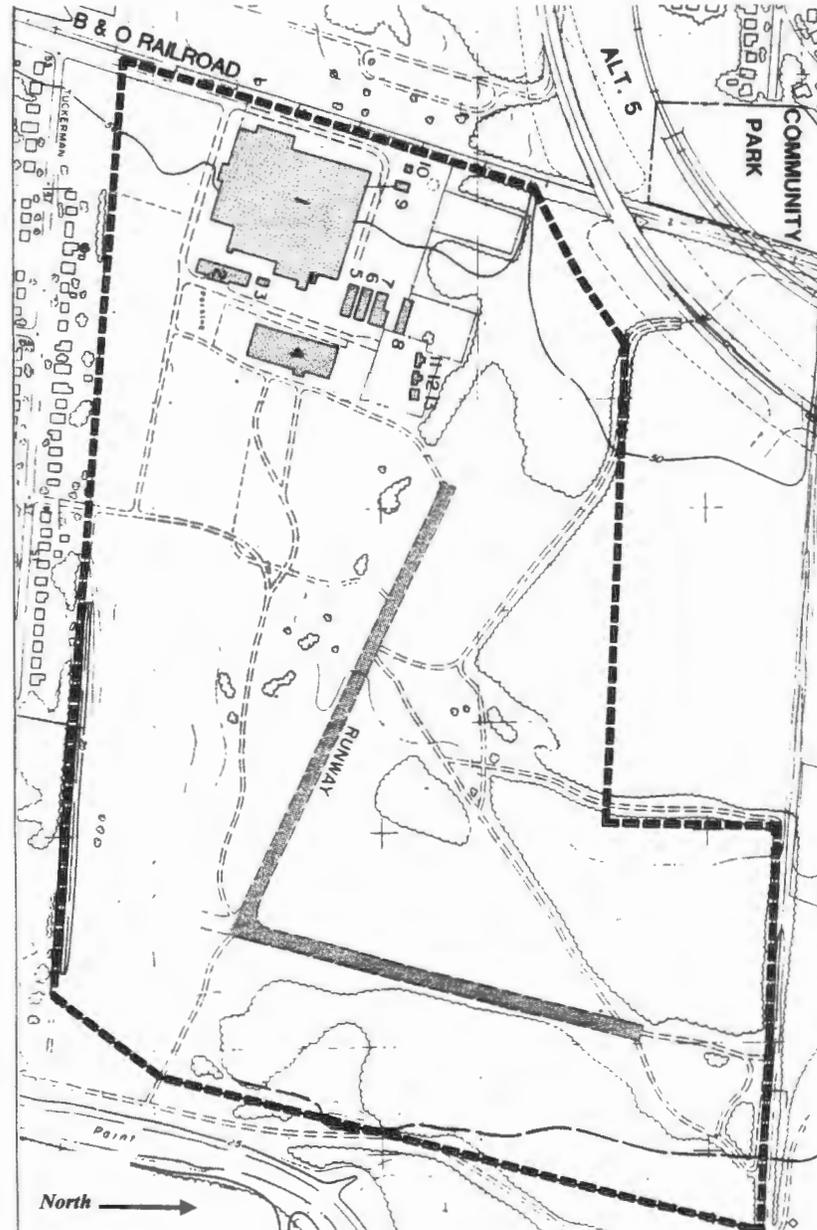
Site plan reproduced from a 1985 John Milner Associates, Inc. report. The ERCO building, identified by the number "1," and buildings "2" and "3" are all that remain of the former thirteen building complex and airfield. Building 2 is constructed of brick and appears to date to the late 1940s or early 1950s. Building 3 is a mid-20th century masonry block structure.
